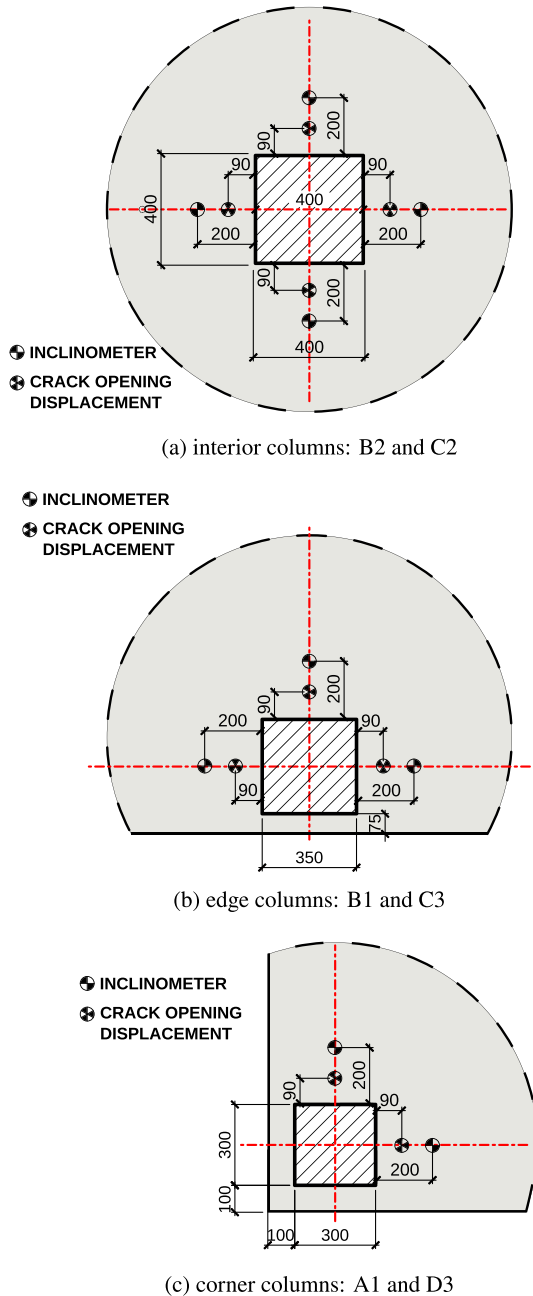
Layout of instruments on the slab-column connection: inclinometers and crack opening through the variation of slab thickness.
